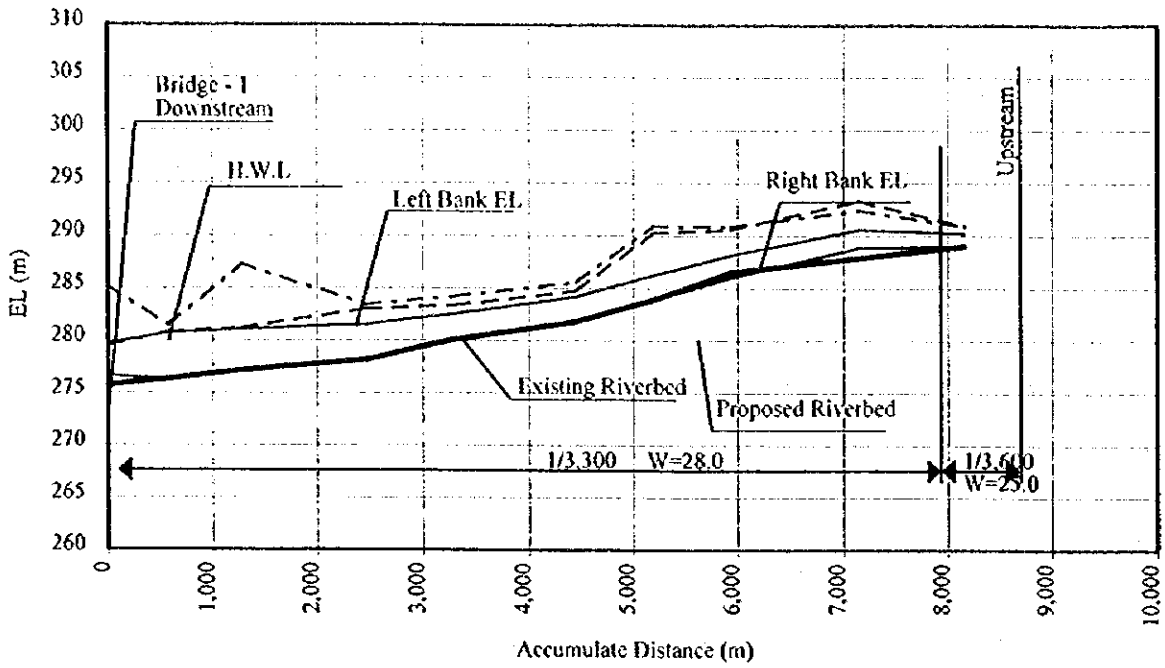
(3) LONGITUDINAL PROFILE OF DRAINAGE IMPROVEMENT
